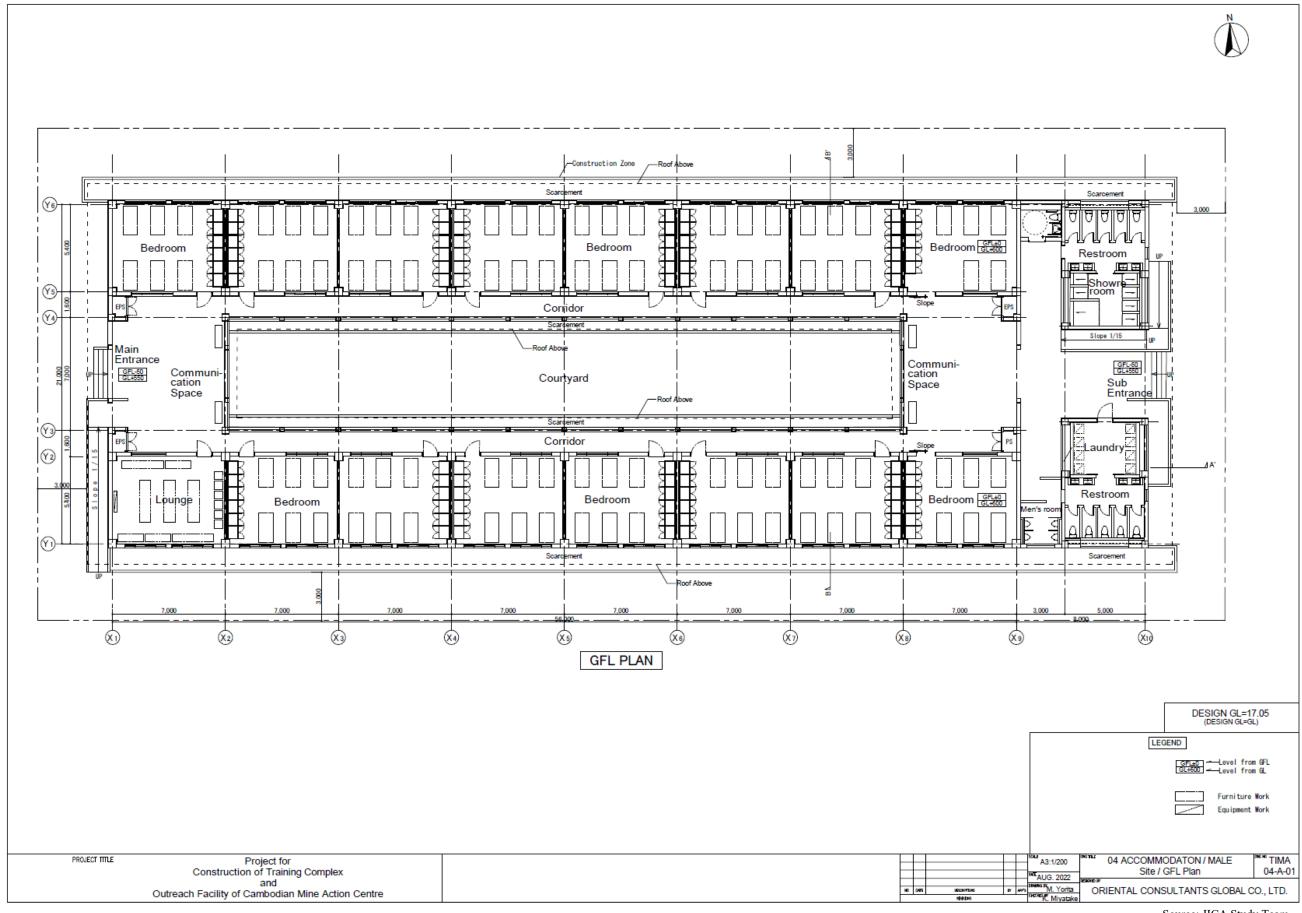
Floor Plan of TIMA Accommodation for Male (GFL)
